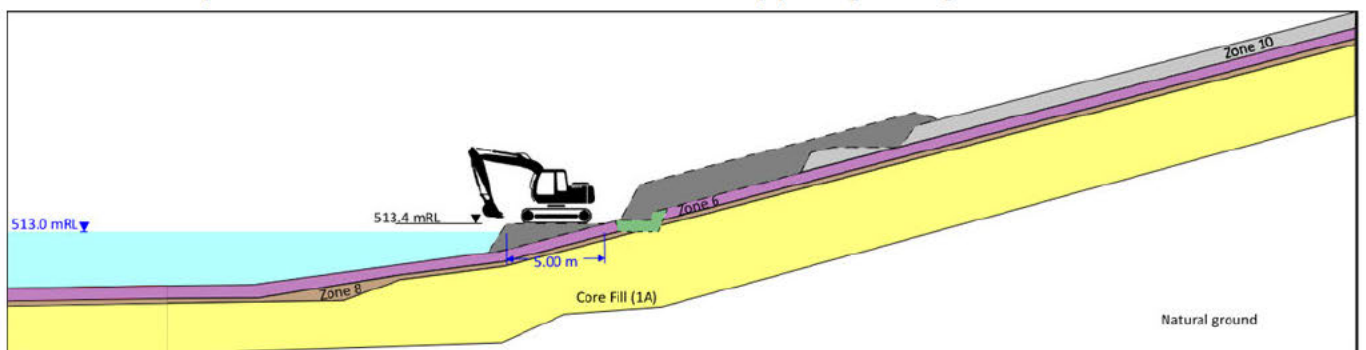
Schematic sketch – Tranche 2 – abutments – establishment of construction bench at 513.4 m RL – Not to Scale
